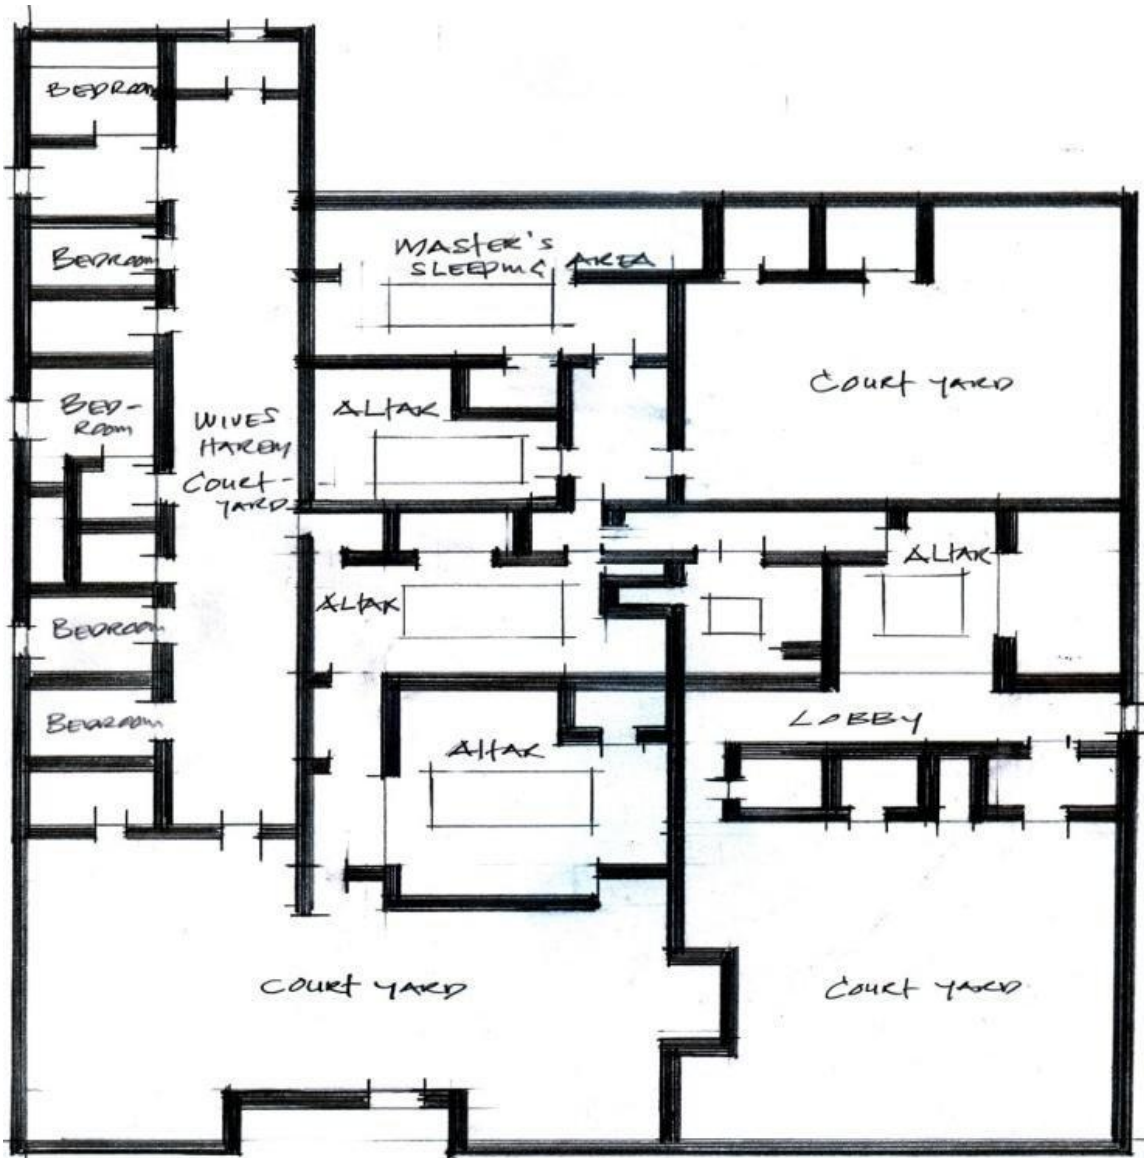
FloorPlan of a Typical Palace Compound in Benin
